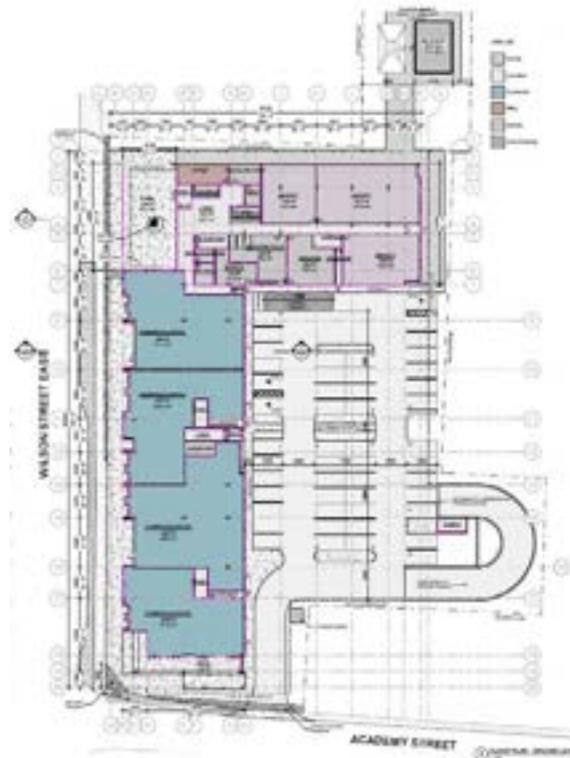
This Site Floor Plan version shows the current appropriate orientation of the Marr-Phillipo House which should and will conform to the siting shown in Figure 17.
